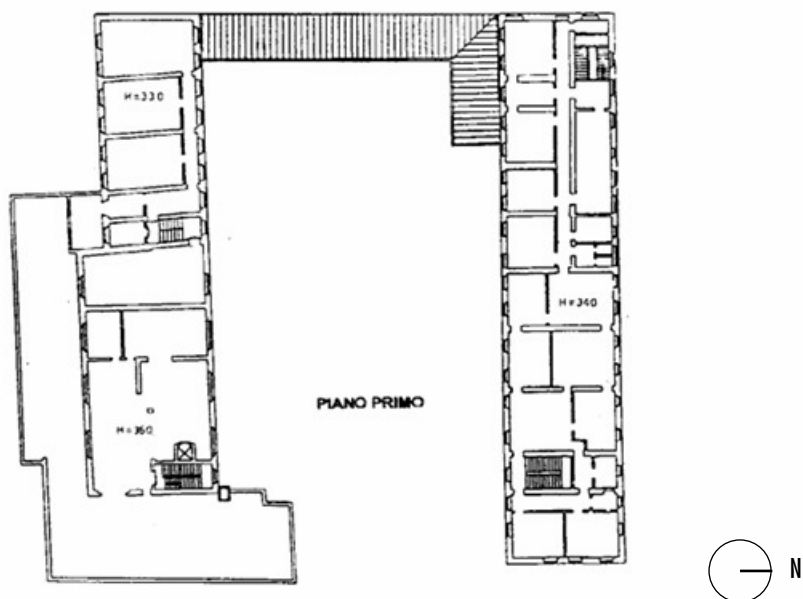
Floor plan of the first floor of Sisters' House I,II, and laundry room.
